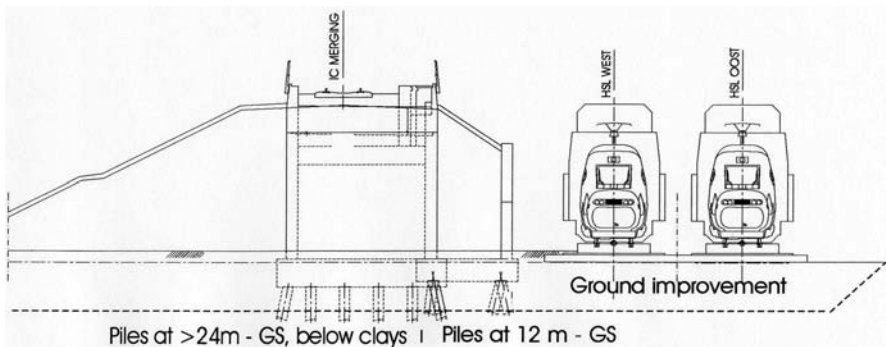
Fly-over Den Hoek; Section at End Column North with Retaining Wall and HSL Settlement Poor Construction.
